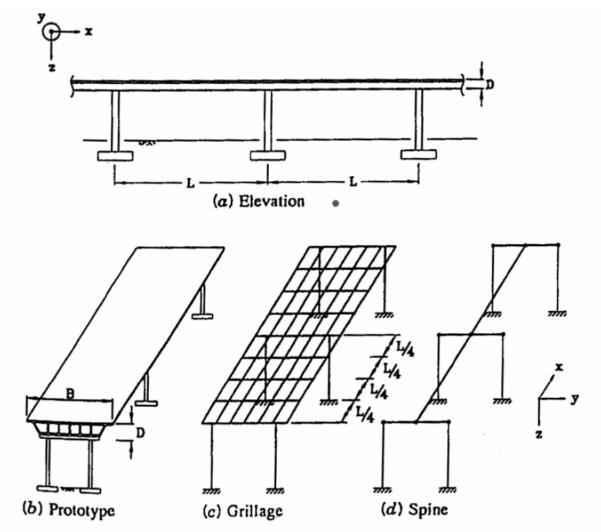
Superstructure Models (Priestley, et al 1996).
